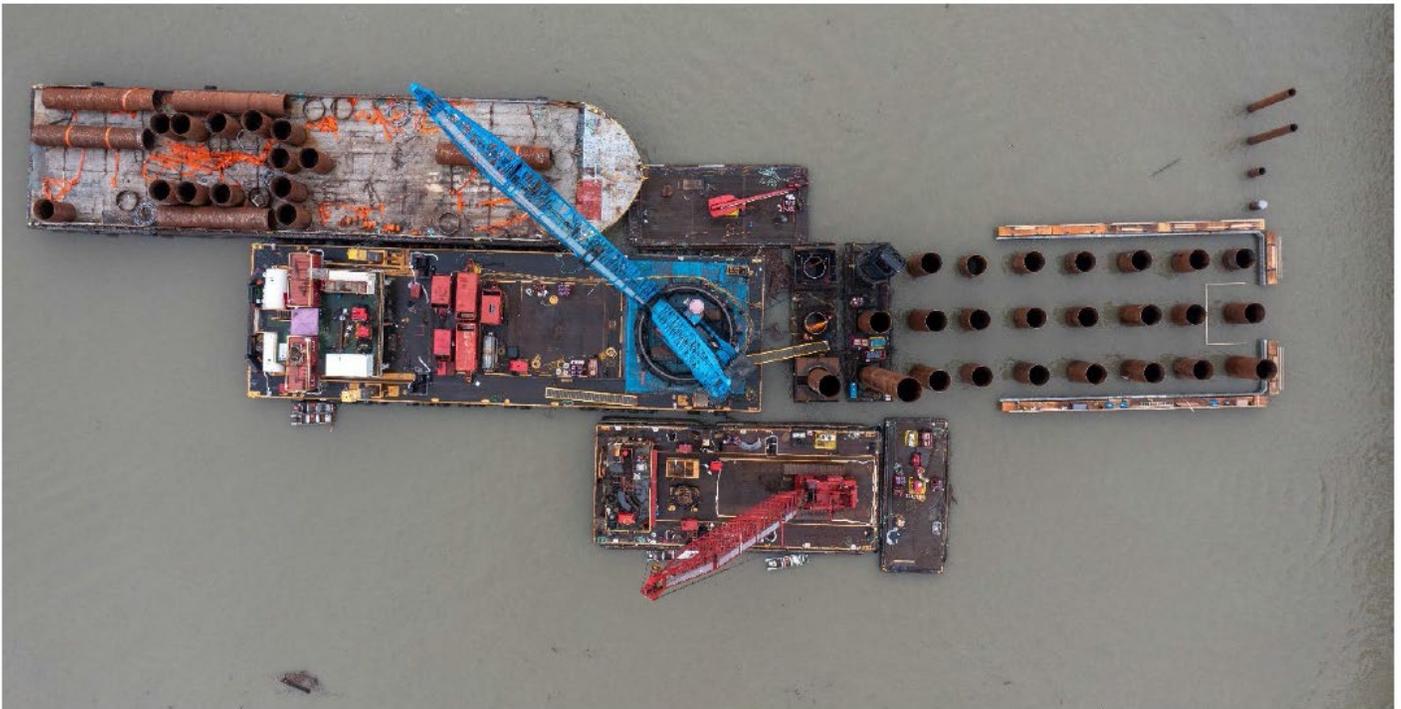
OVERHEAD VIEW OF PILE INSTALLATION PROGRESS AT PIER S1
